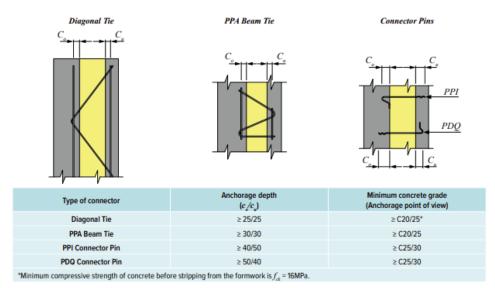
Concrete cover of Ties and Connector Pins with minimum concrete grades (Peikko, 2021)
